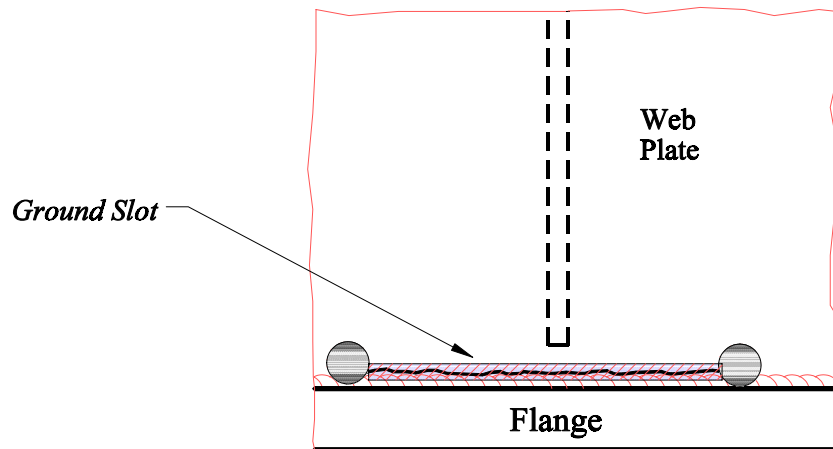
Removal of web-to-flange fillet weld crack.
